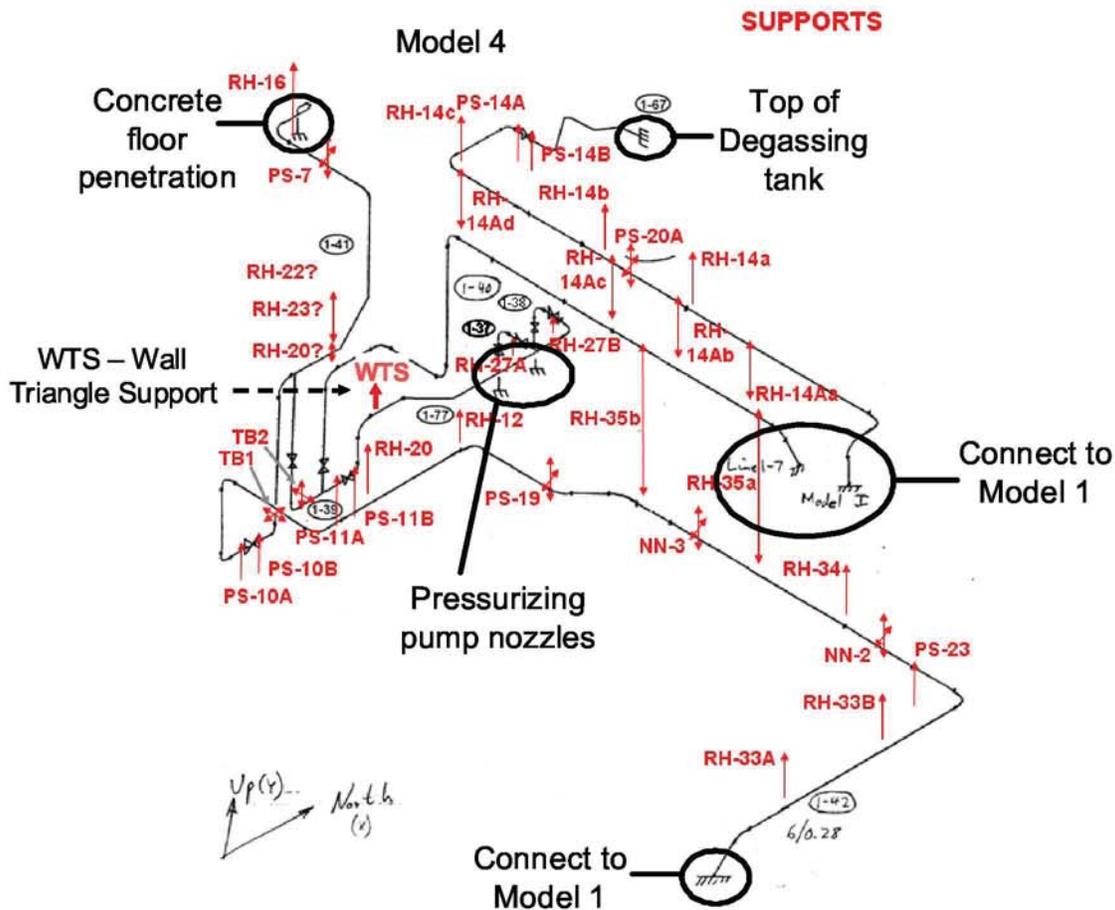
Piping section of Model 14, showing original 4 beam model with terminations.
